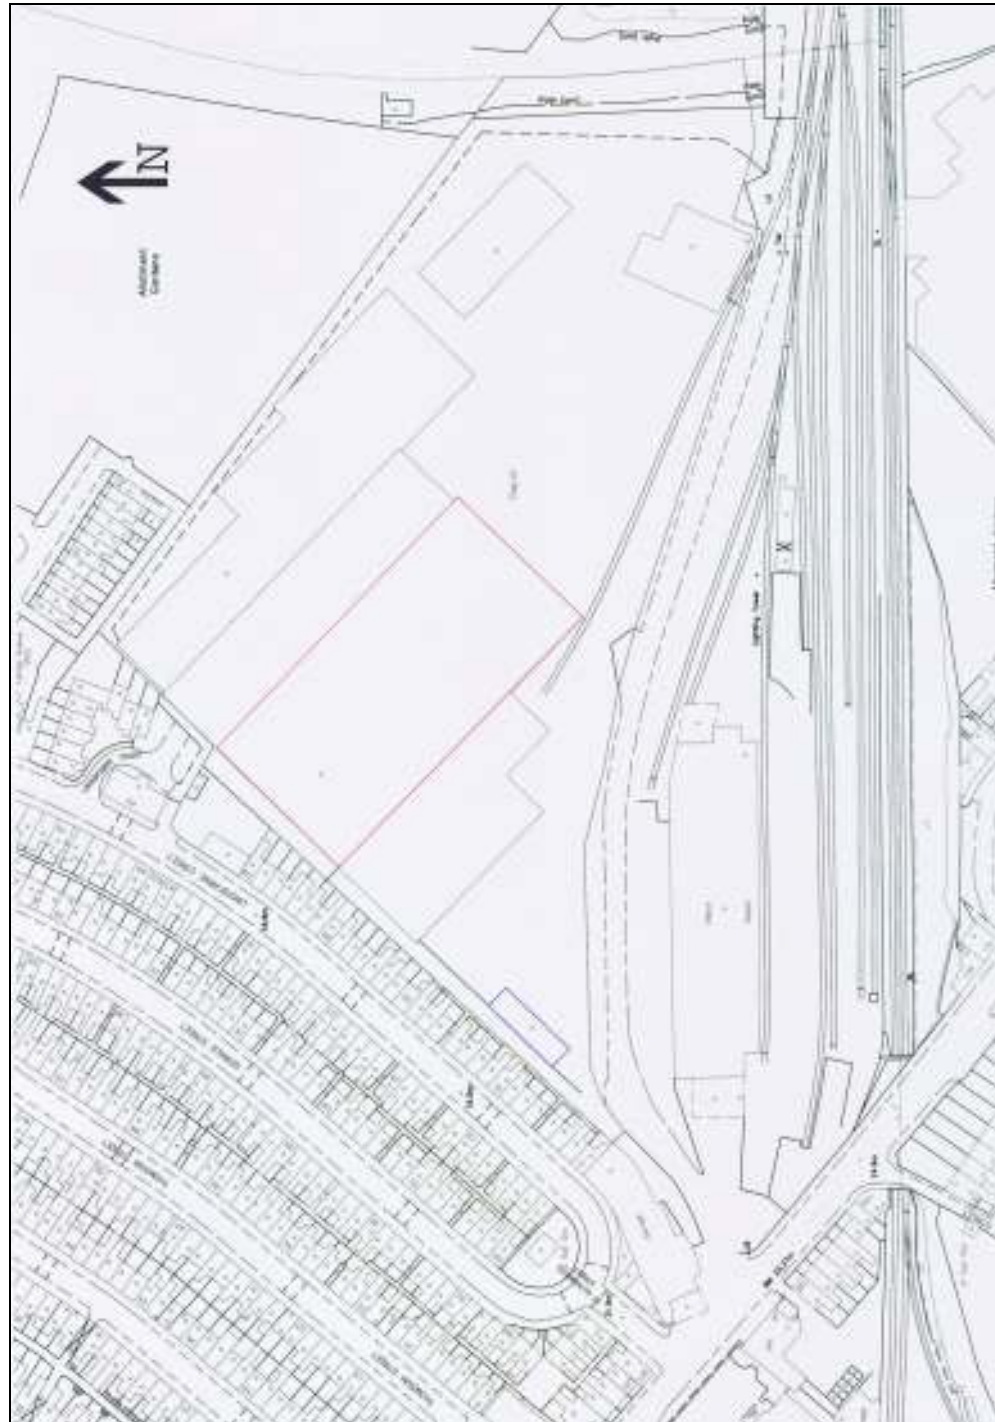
Site Plan (Scale 1:1000). The North Eastern Railway engine shed is outlined in red and the workshop range is outlined blue
